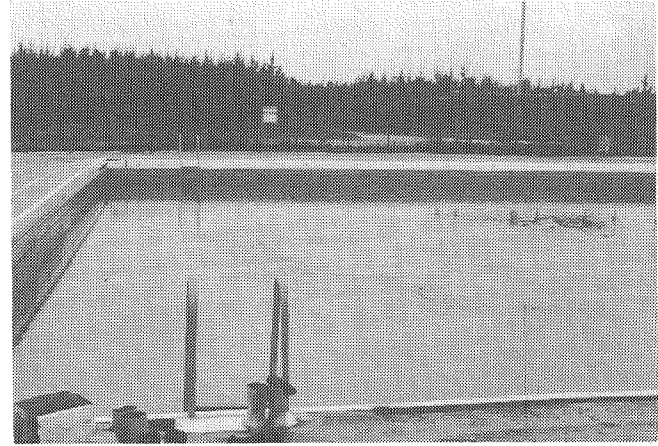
A Swimming Pool Damaged by Soil Liquefaction at Arahama
